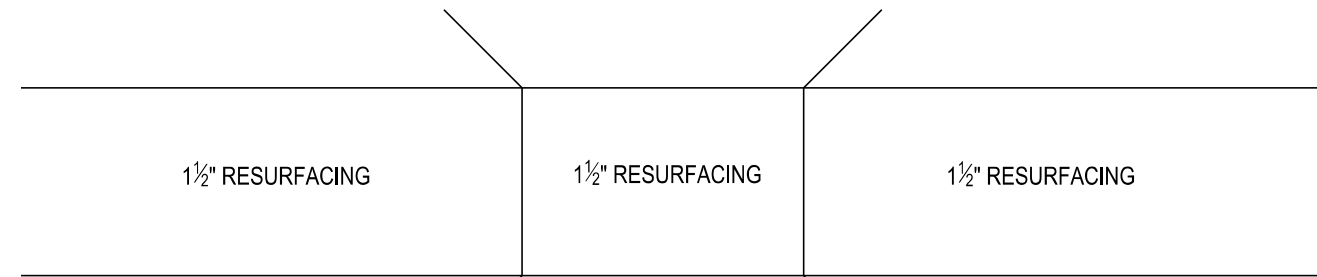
DETAILS OF PATCHING EXISTING PAVEMENT PRIOR TO RESURFACING
